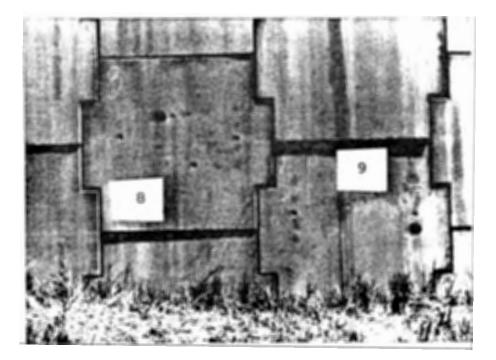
Structure 4: Panels chosen for study at low point on wall.
